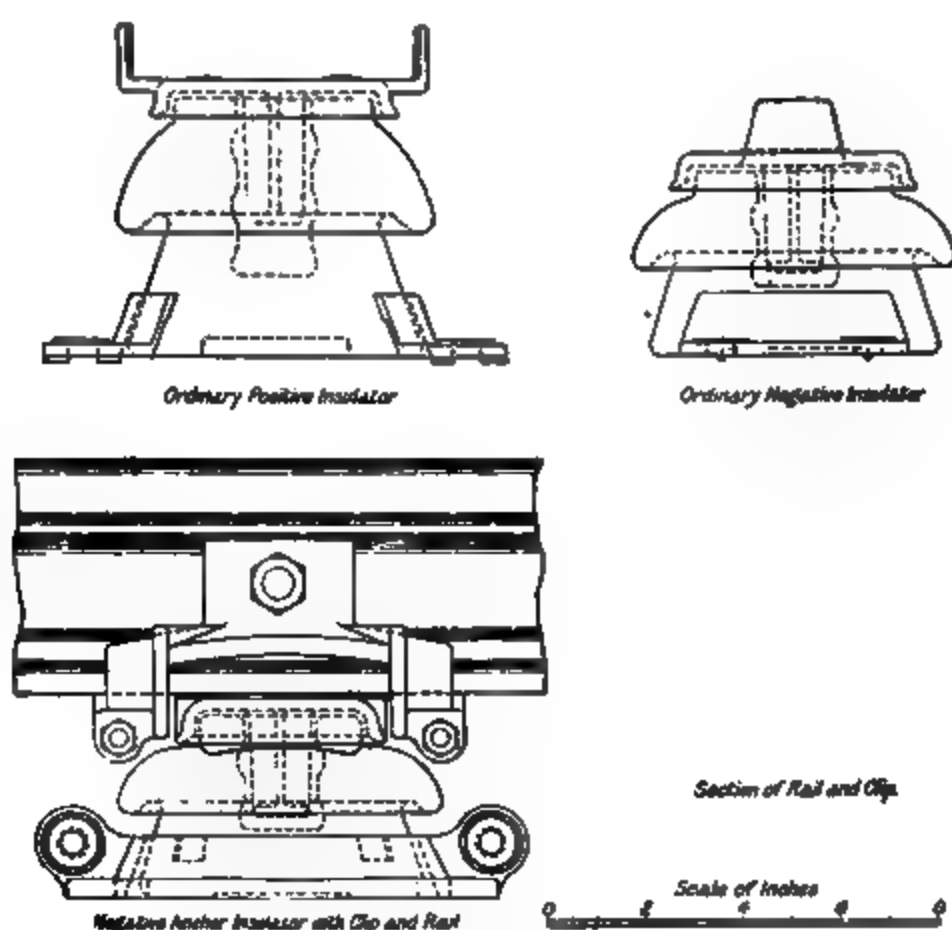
Detail of Doulton's Conductor Rail Insulators, and Method of Anchoring Conductor Rail (London and North-Western Railway).
